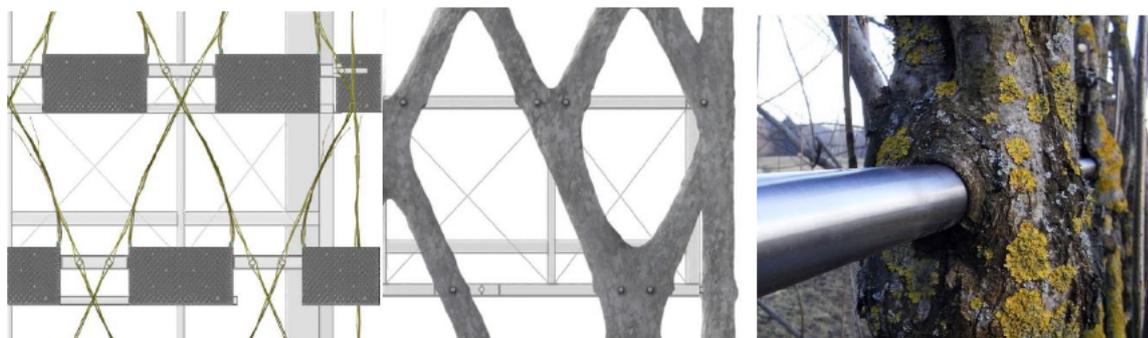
Elevational view showing the progression from young branches to strong trunks. Image shows the merging of the steel and tree trunk
